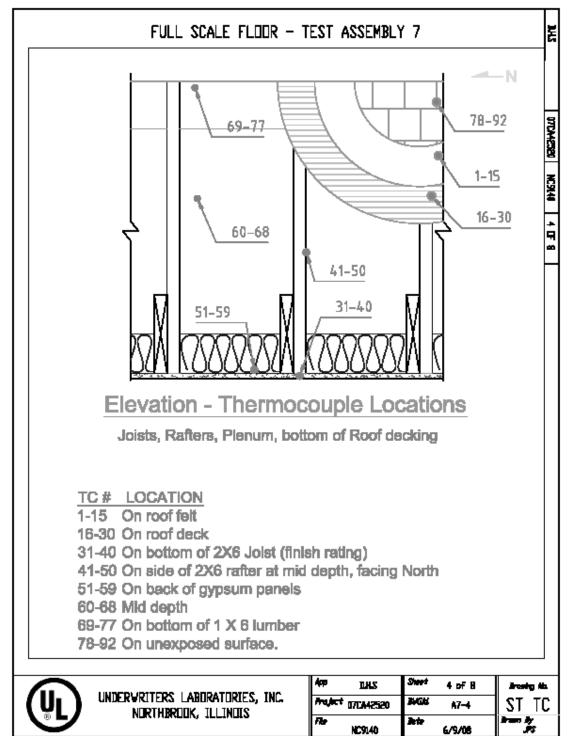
Ther	mocouple	Locations -	Elevation.
